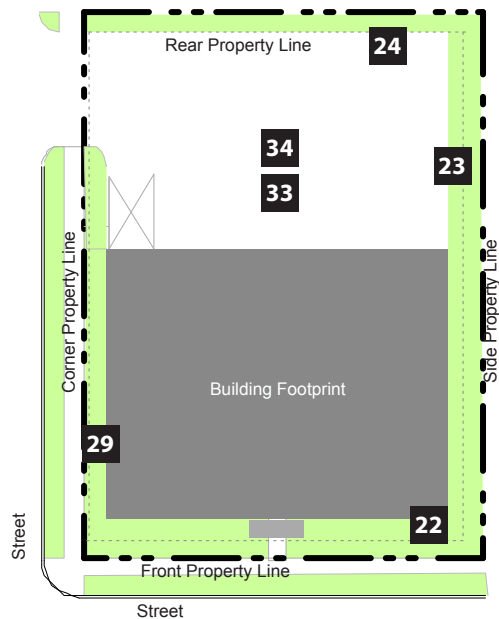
Civic building siting diagram shown with side vehicular access and tower at entry. Not to scale.
